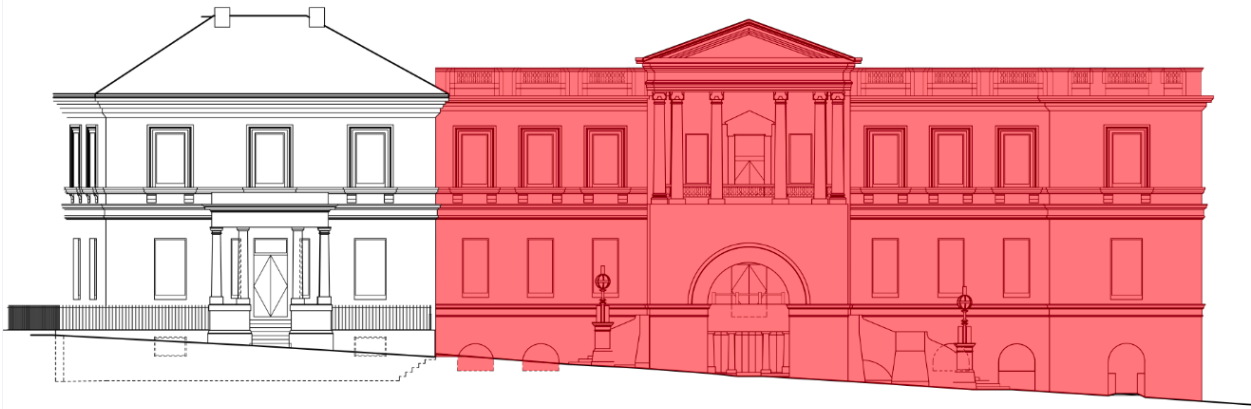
Diagram indicating building stage relevant to this section of the Historical Overview shaded red
